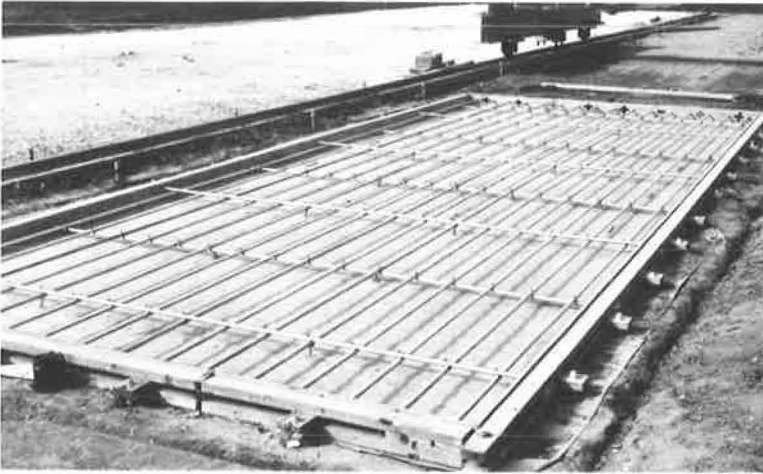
Grid of flexible conduit prepared for slab with two-way prestress.
